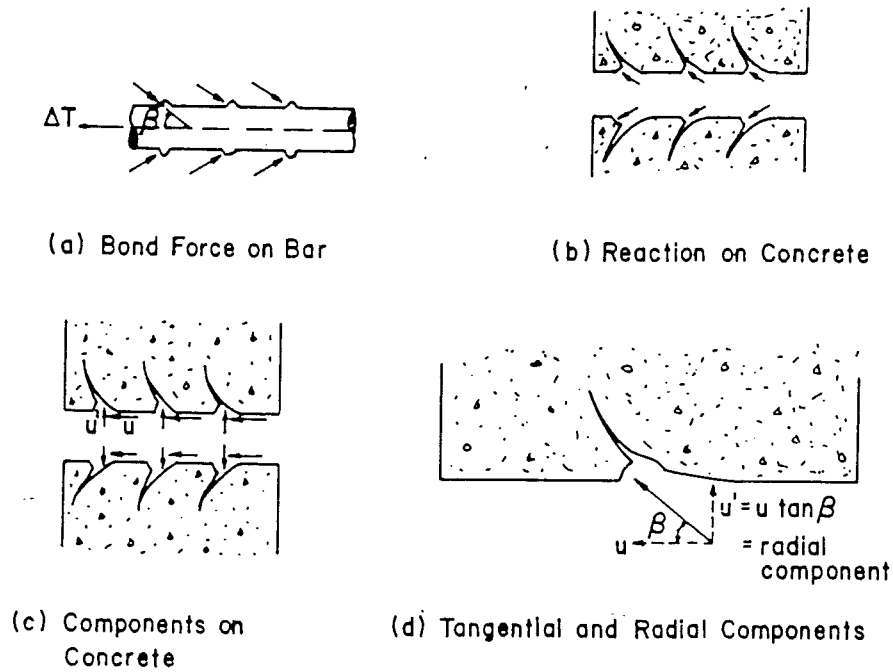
Forces Between a Reinforcing Bar and the Surrounding Concrete [5].
